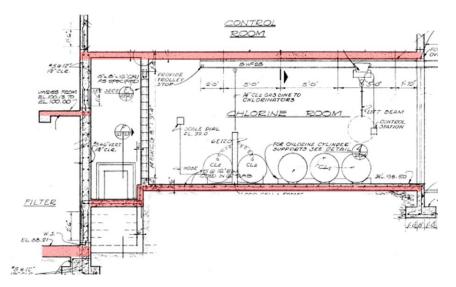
Control/Treatment Building (1970) and Filter Floor/Roof Levels not Aligned (Source Drawings: "Water Treatment Plant (A700004)")
